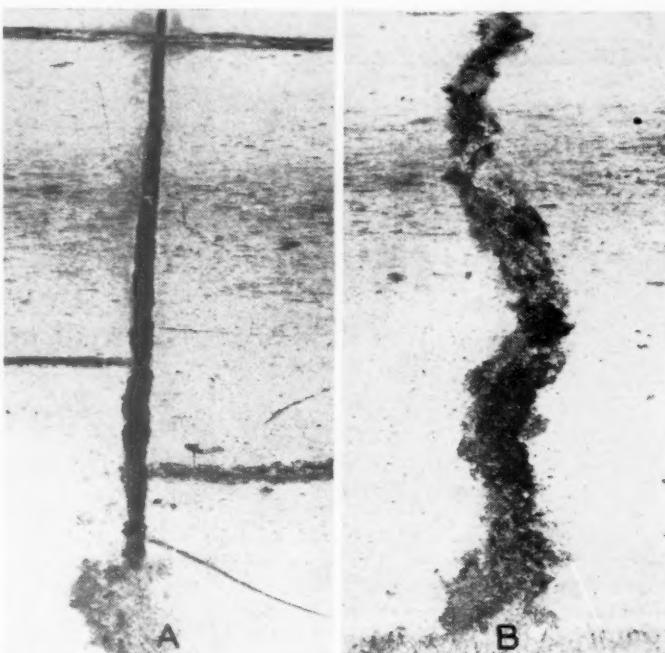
A, NORMAL JOINT IN A TYPICAL OLD PAVEMENT; B, NORMAL CRACK IN A TYPICAL OLD PAVEMENT.
